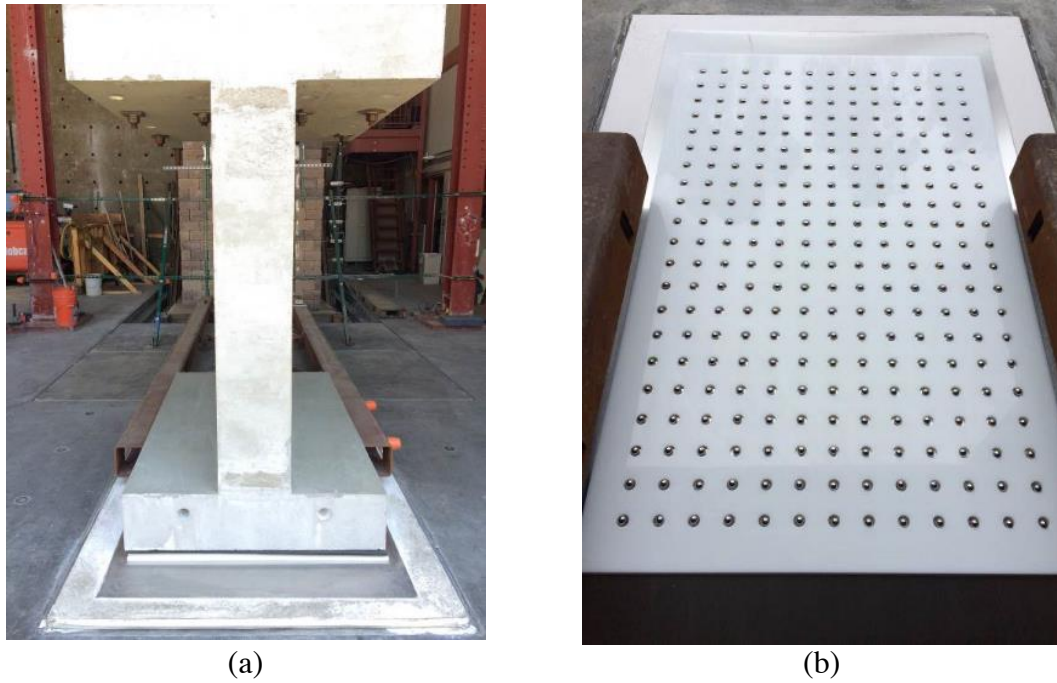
Bridge support wall: (a) end view; (b) low friction sliding platform.
